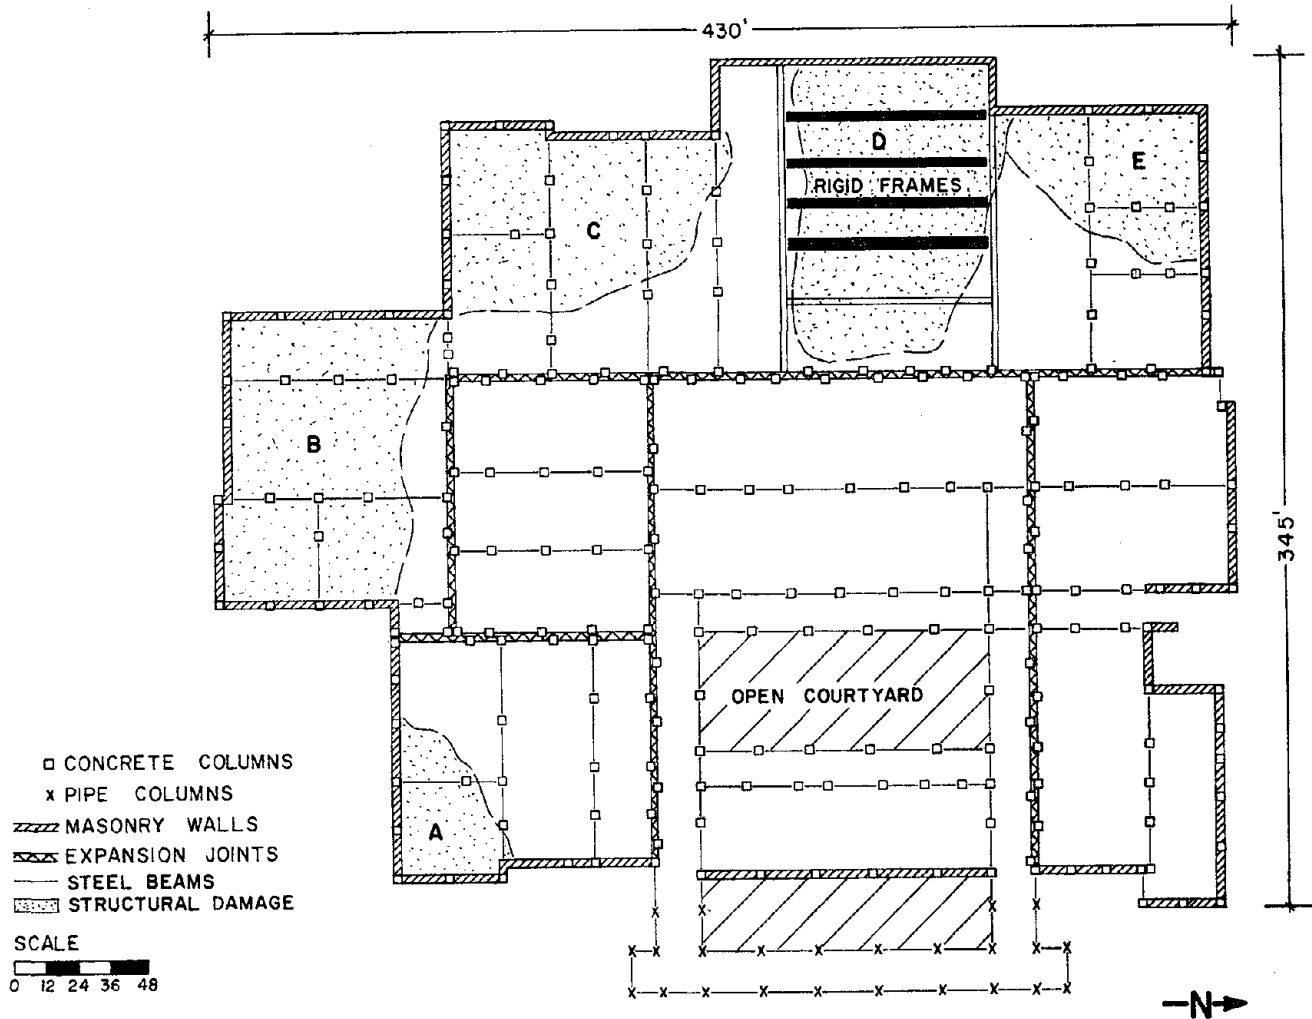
LAYOUT OF THE DAMAGED SCHOOL
